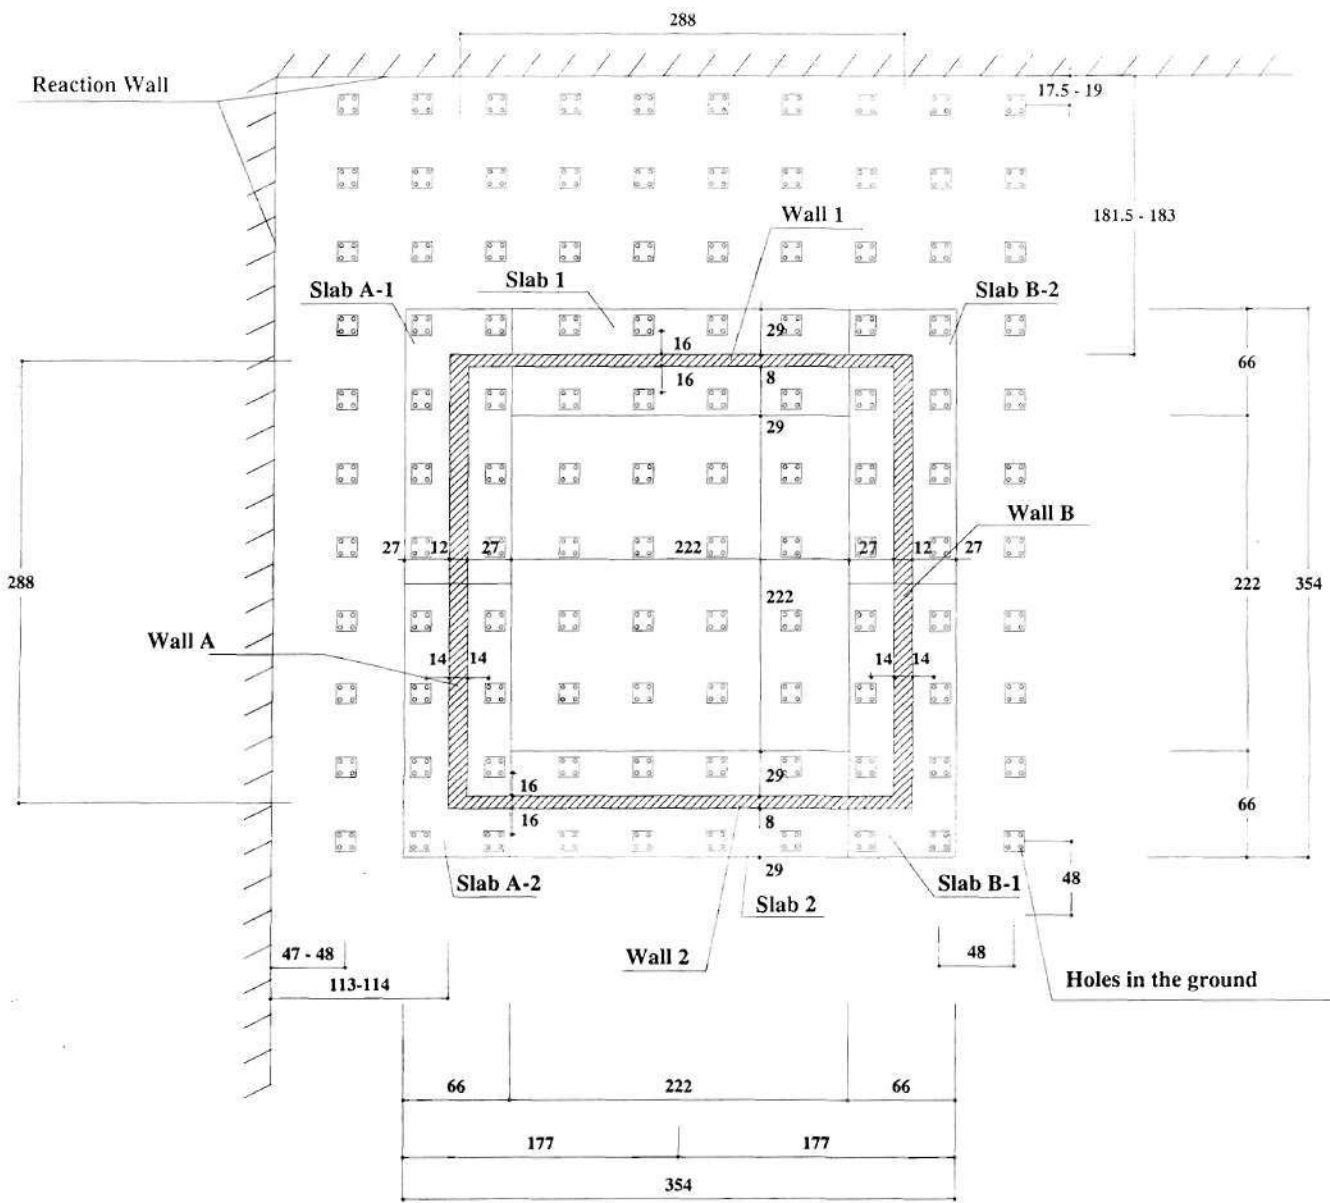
Plan view of foundation layout (dimensions are in in.).
